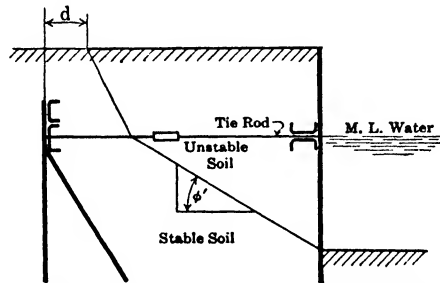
Anchored Steel Sheet-piling Bulkhead.
